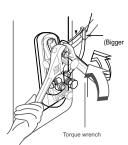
Use Wrench and Torque Wrench to Connect or Disconnect Pipes
